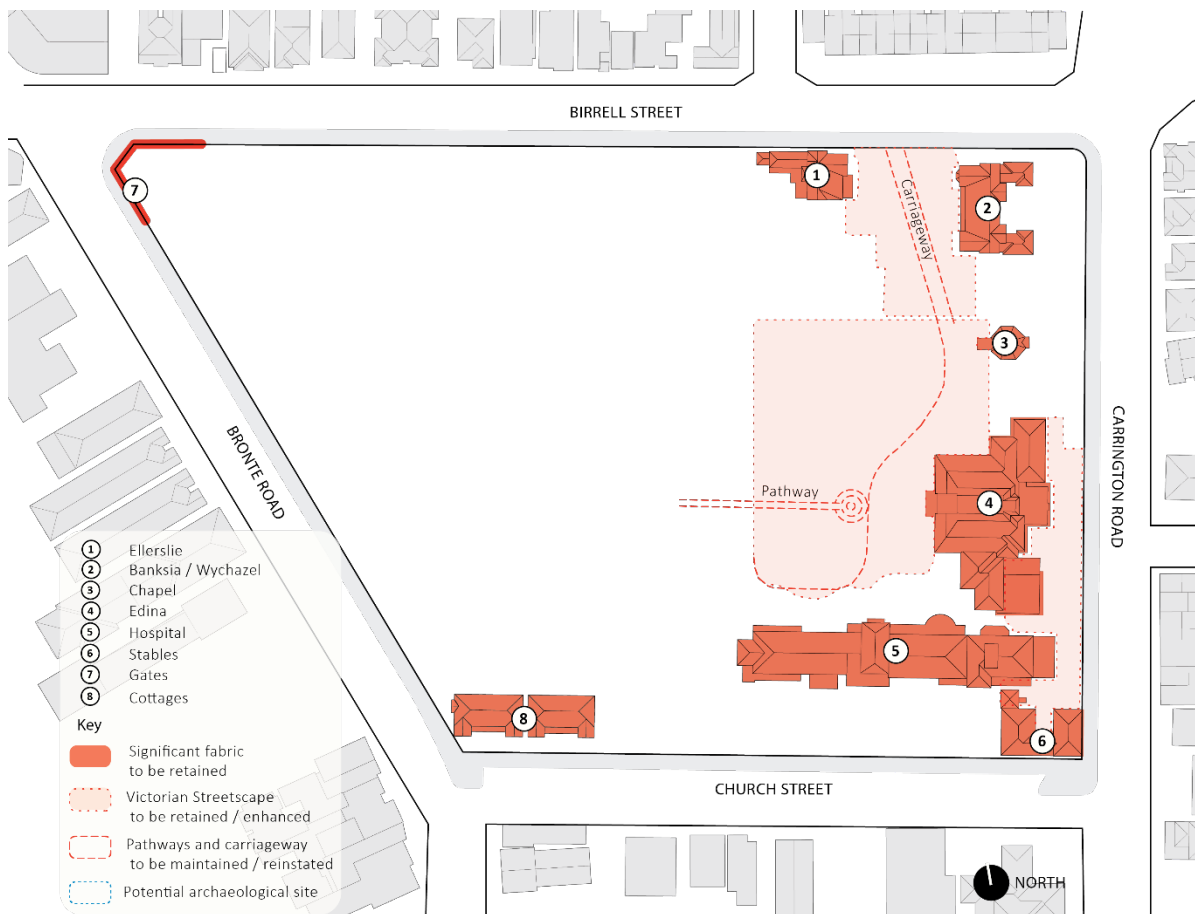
Site Plan identifying significant fabric and spaces to be retained
